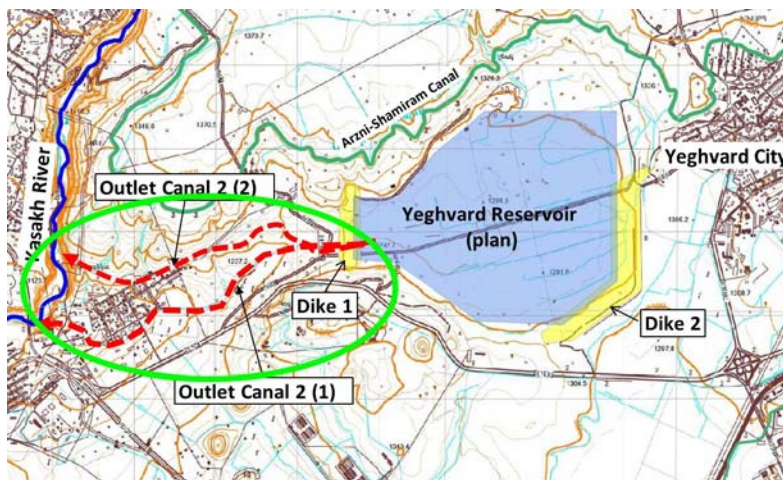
Examination of Options for Outlet Canal 2
